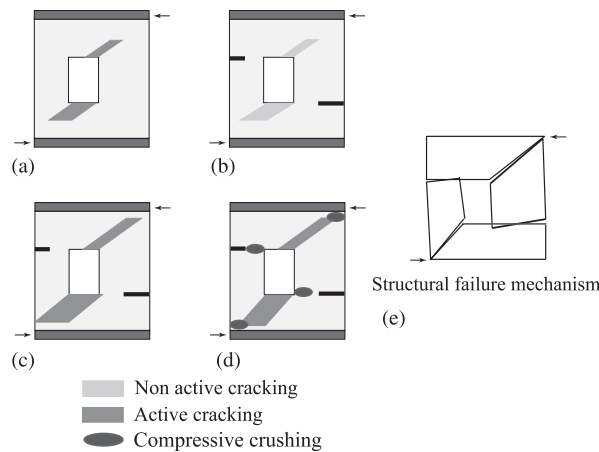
Shear test on a wall with opening—successive cracking states observed in experiments [40].
